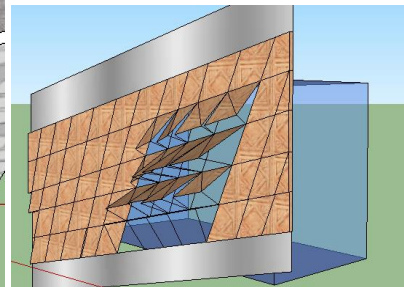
the mechanism of the facade panels (sketchup.pro 8)
